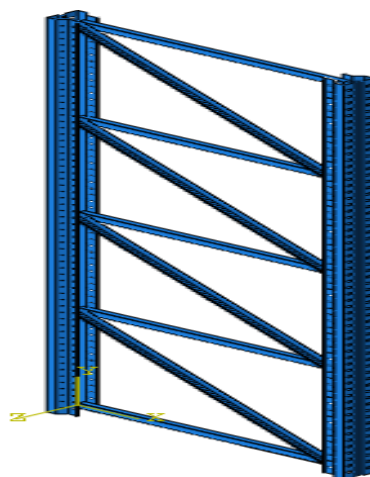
Typical B2 type frame with inclined and horizontal bracing only
